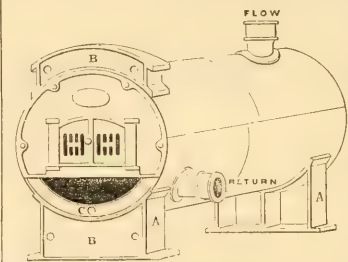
STEVENSON'S IMPROVED CORNISH BOILER.
